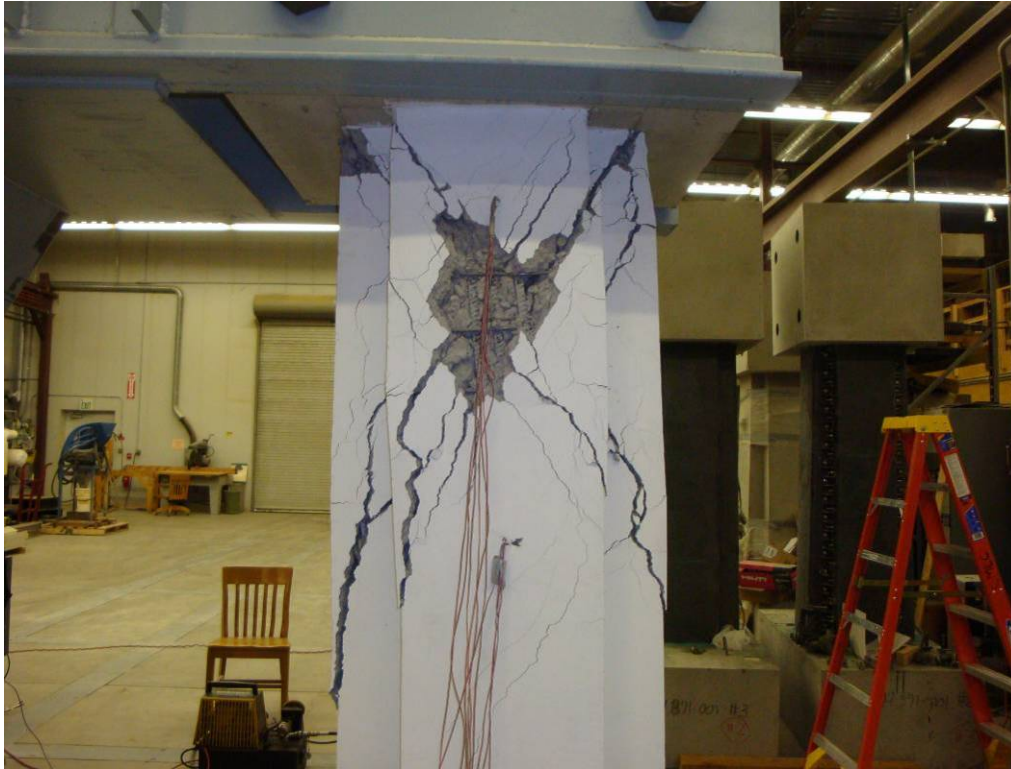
Column 1 Shear Cracking Near the End of Testing.
